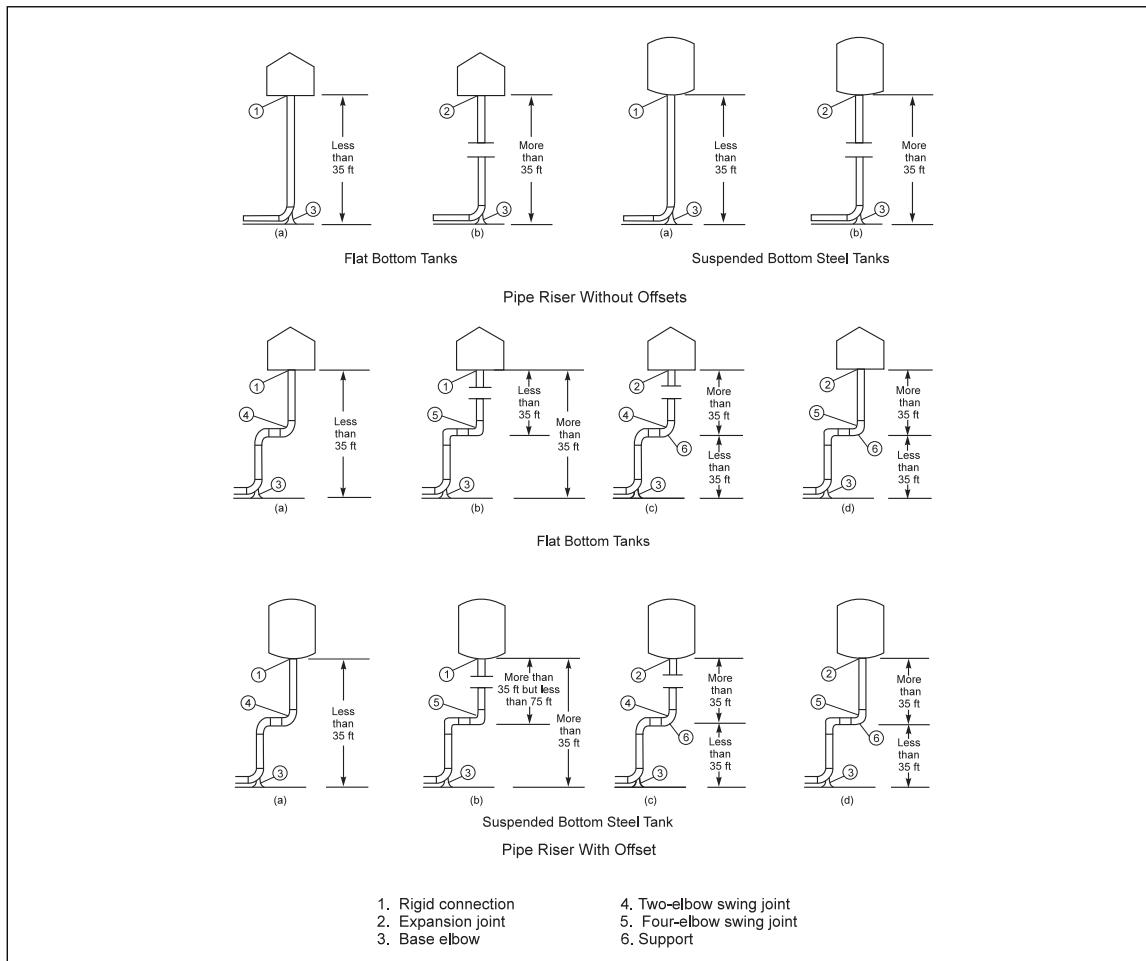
Support and provision for expansion of pipe risers (35 ft = 10.7 m; 75 ft = 22.8 m)
